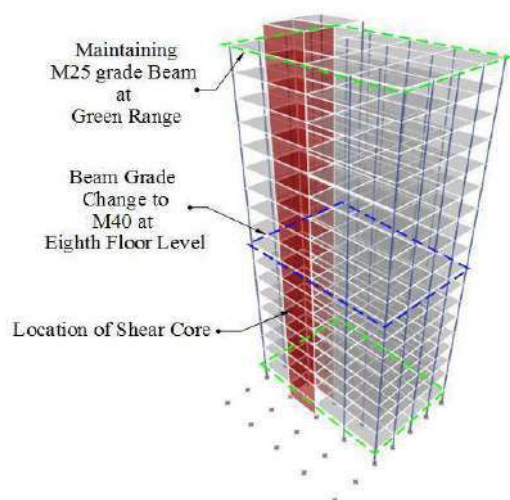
Beam Stability Case - Beams of different sizes (All M40 grade beams at eighth floor level): Case BS4
